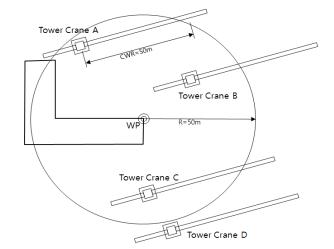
Tower Cranes Installation Area(CWR=50m)
